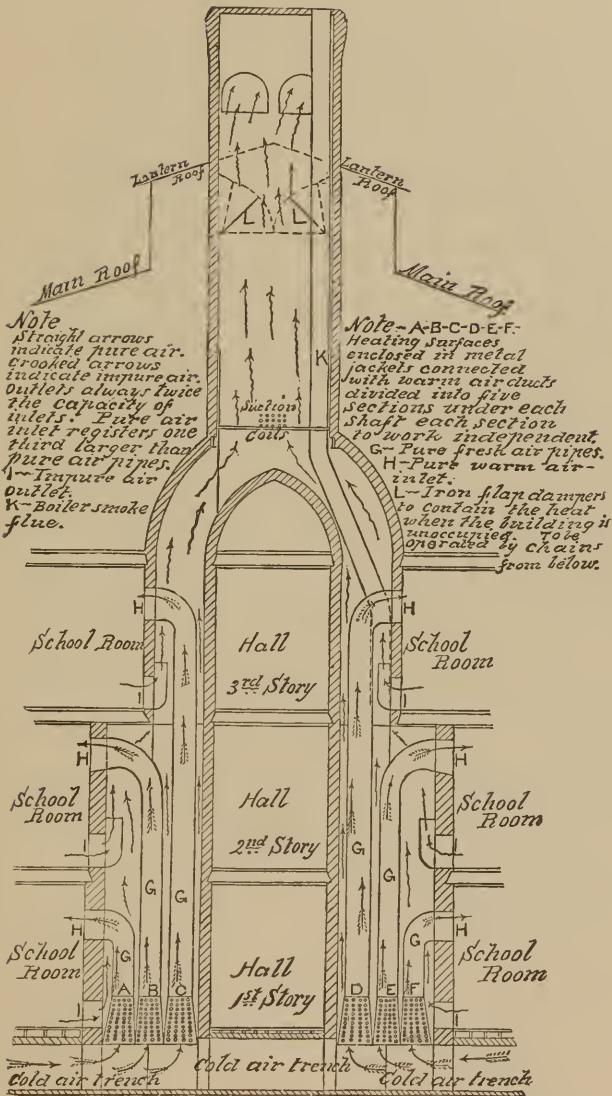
VERTICAL SECTION OF SCHOOL BUILDING.
